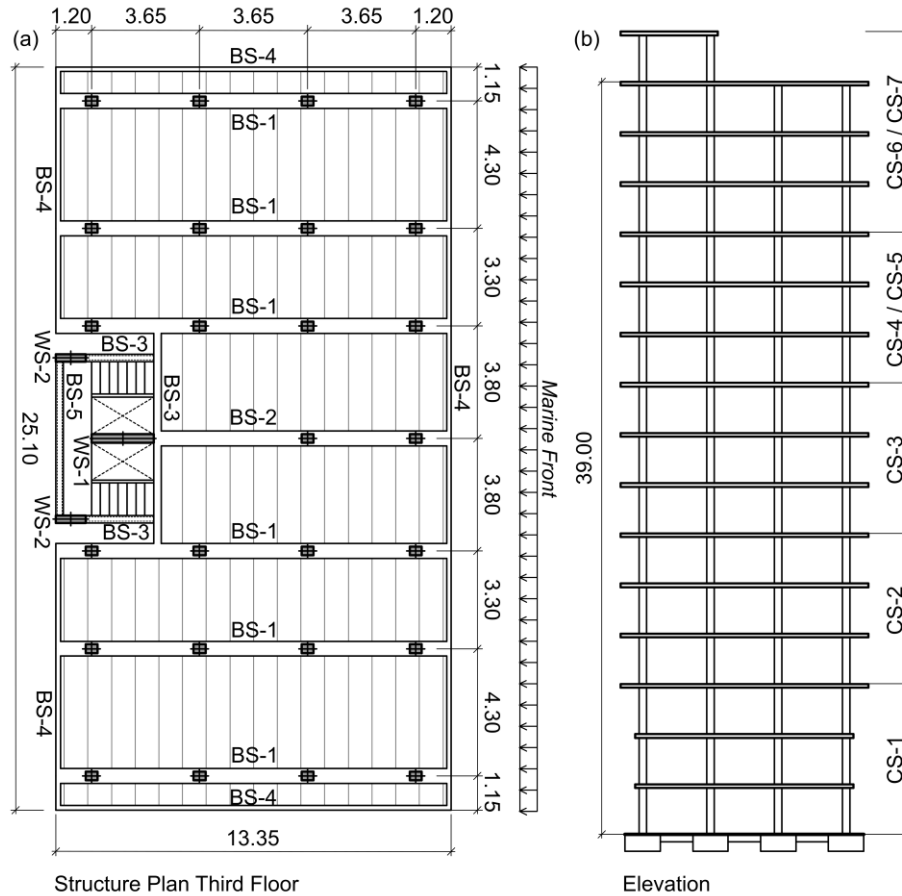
General structural scheme (a) XY view, (b) YZ elevation view.
